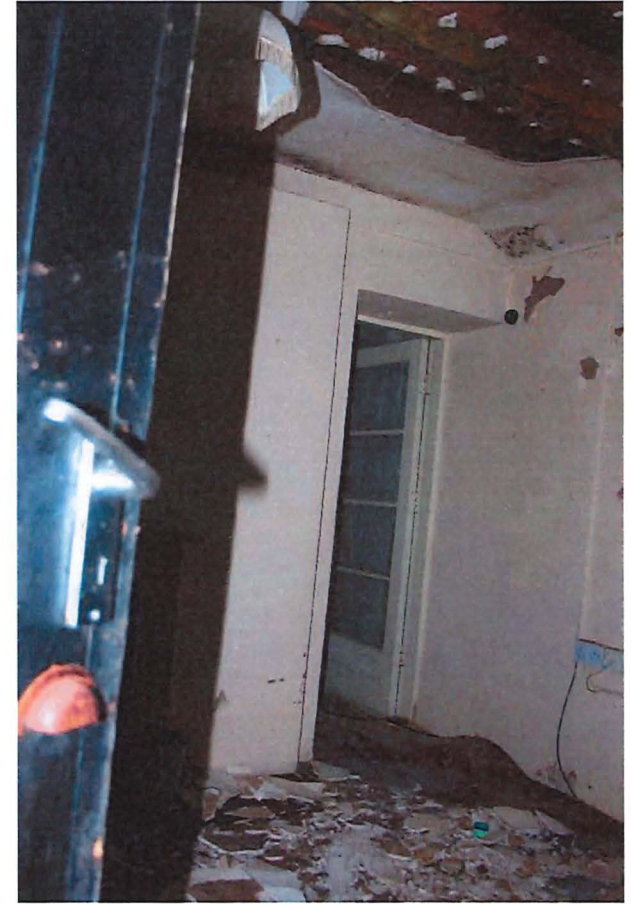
Room 1-04, looking northeast. Non-original timber door with glazed panels.
